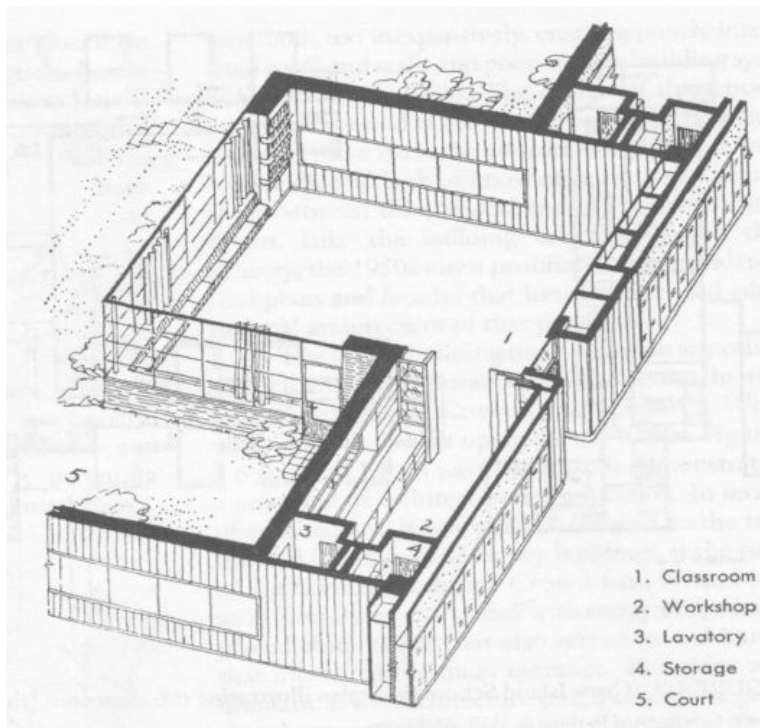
Crow Island School Floor Plan, Winnetka, Illinois, 1940.³⁴
